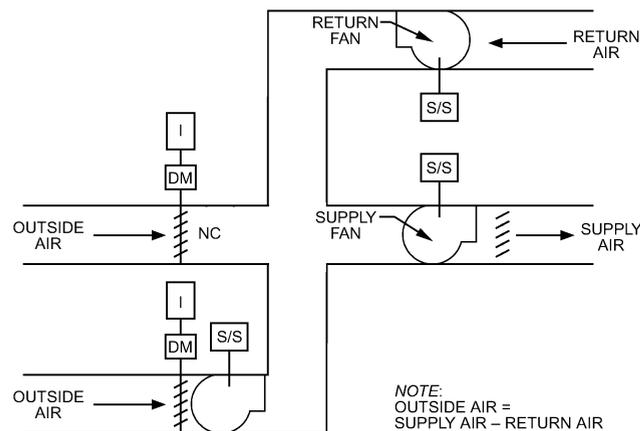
Fixed Minimum Outside Air Control With Return Fans
